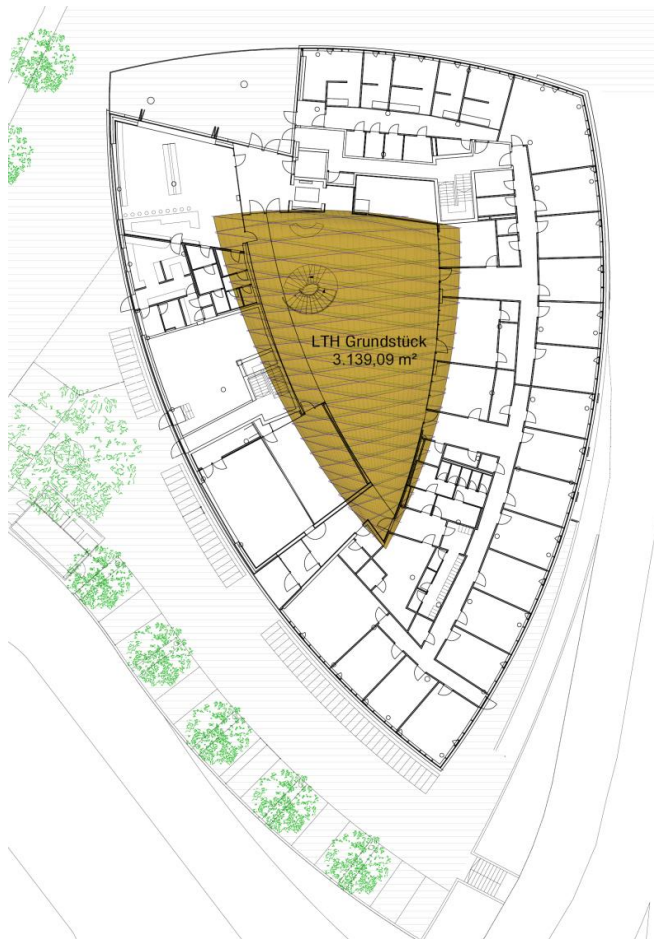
plan view Lilienthalhaus with highlighted ETFE-cushion roof (Rüdiger Architekten/formTL)
